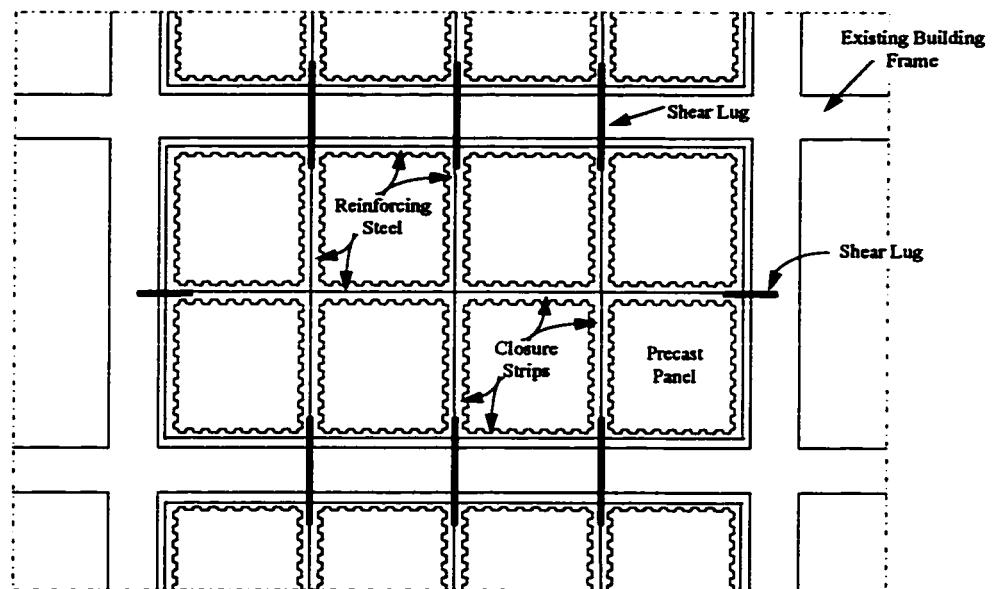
Closure Strip and Shear Lug in Precast Infill Wall
